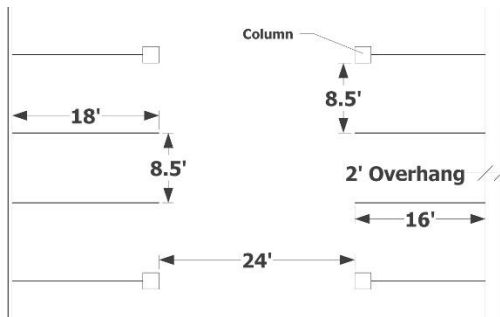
Parking structure stall dimensions for uses with a low parking turnover rate.
